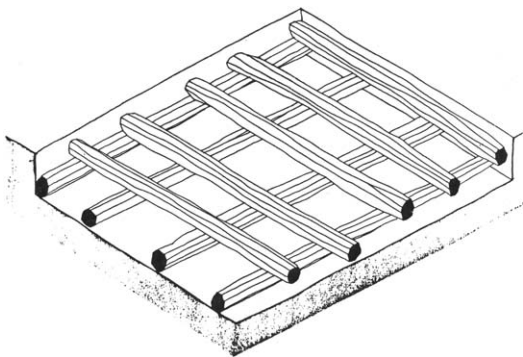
Grid of trunks under the foundation of buildings (schematic [2]).
